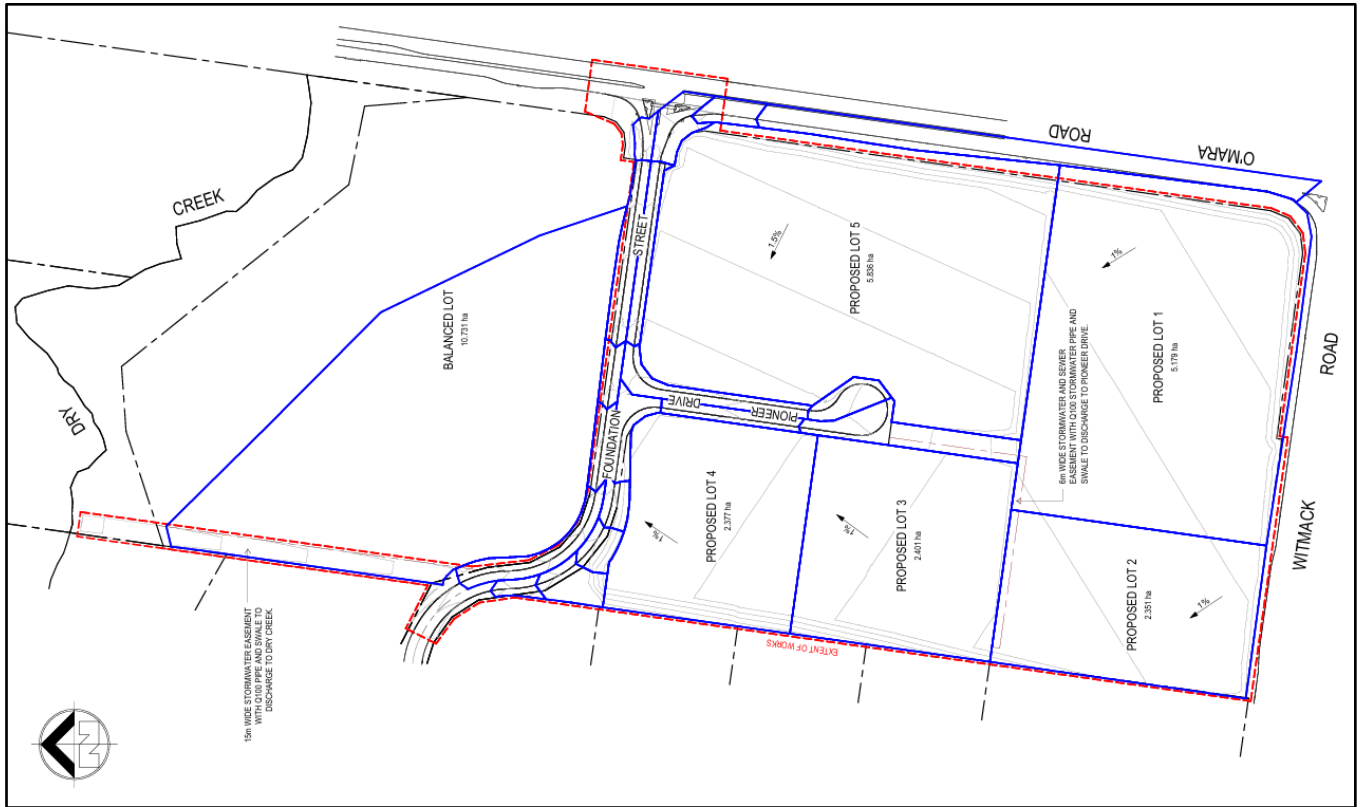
EXISTING STORMWATER CATCHMENT PLANS (I3 DRAWING NO. 21-059-C32/B)
